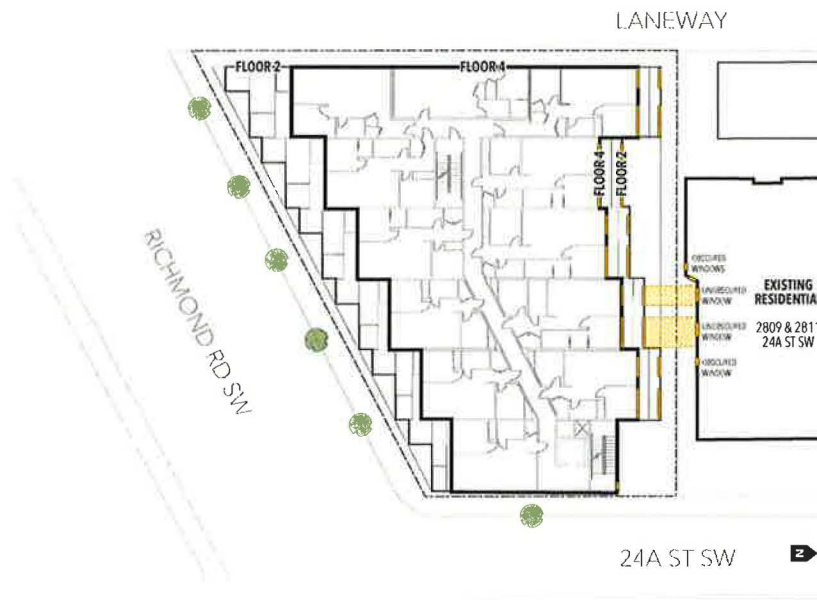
FLOOR 4 PLAN | FLOORS 2 & 4 WINDOWS & SIGHT LINES
